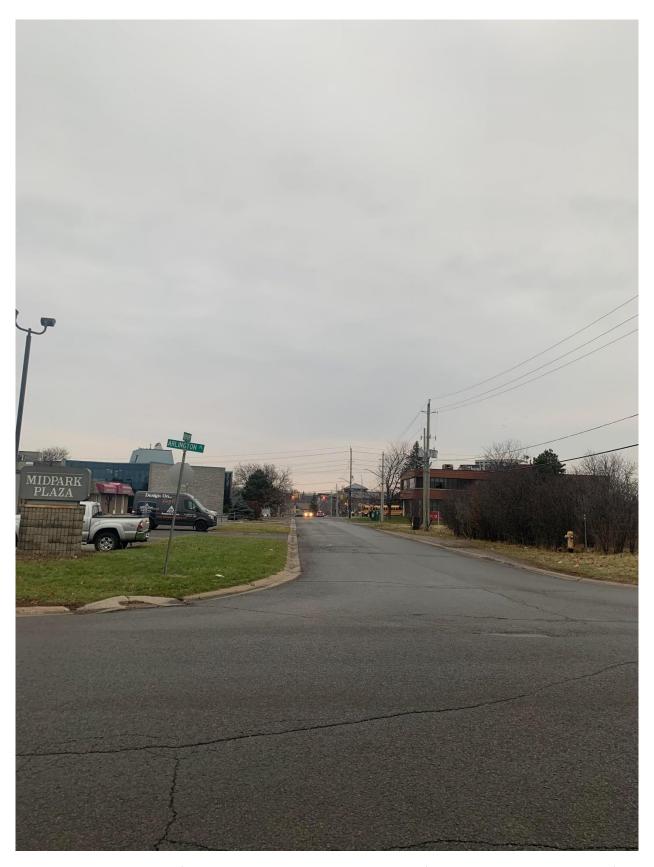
Intersection of Arlington Park Place and Midpark Drive (photo taken December 1, 2023).
